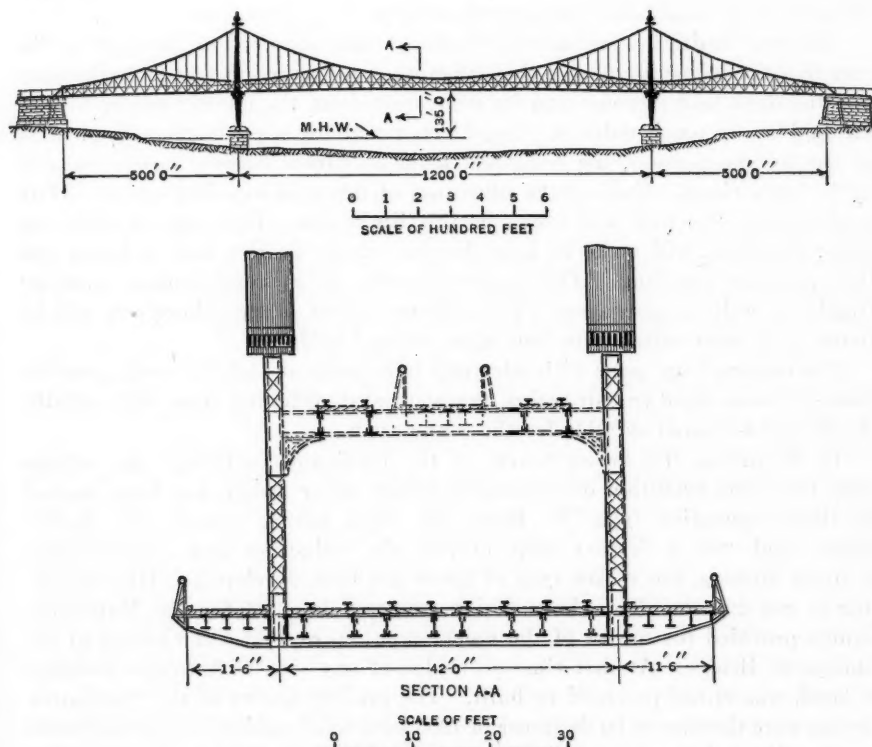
SECTION OF PROPOSED BRIDGE OVER THE KILL VAN KULL.
